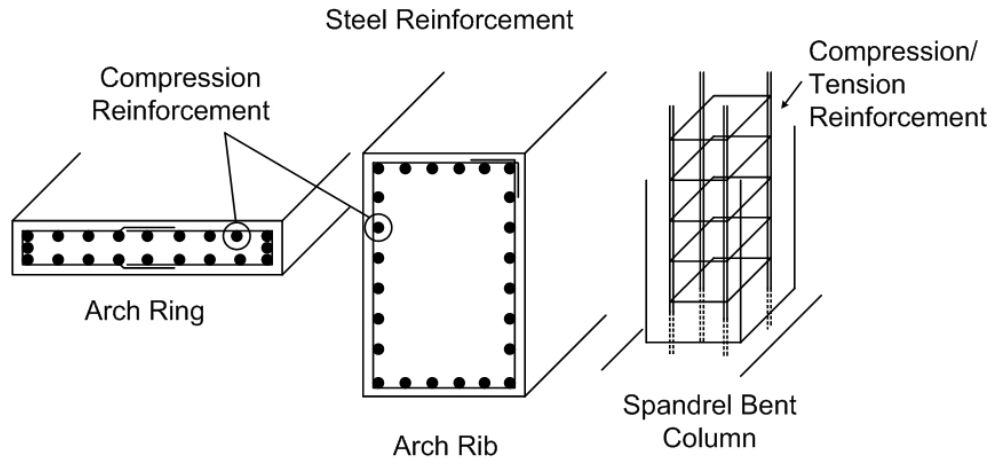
Open Spandrel Arch and Spandrel Bent Column Reinforcement
